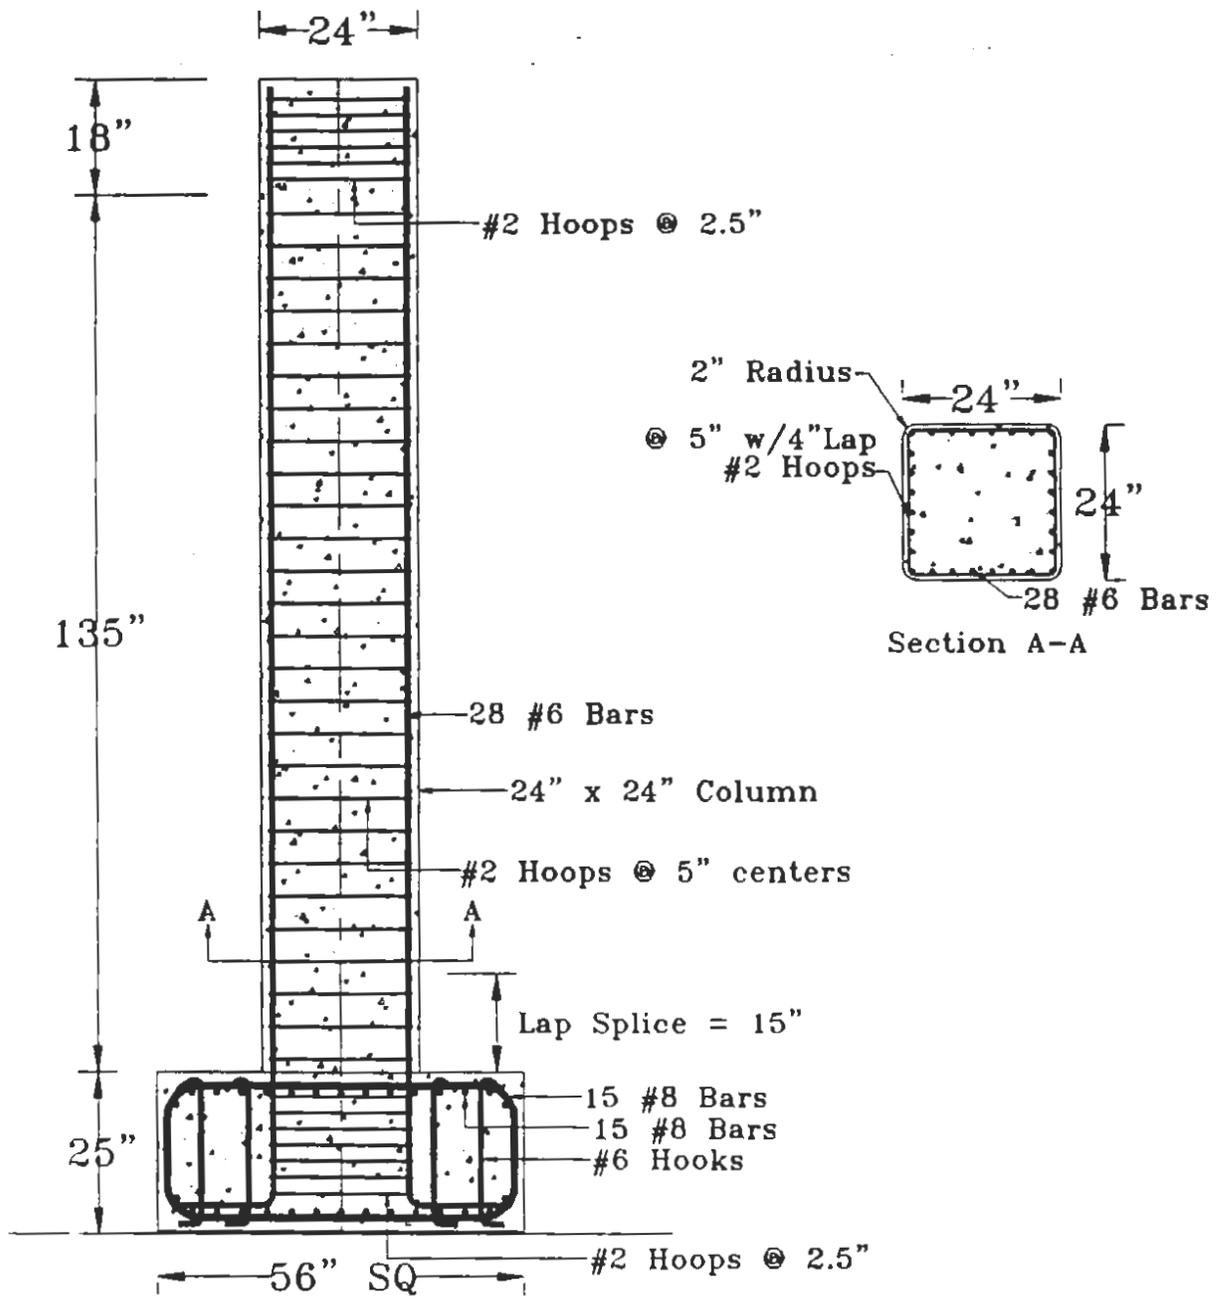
Reinforcement Details for Lap Splice Enhancement Rectangular Columns
